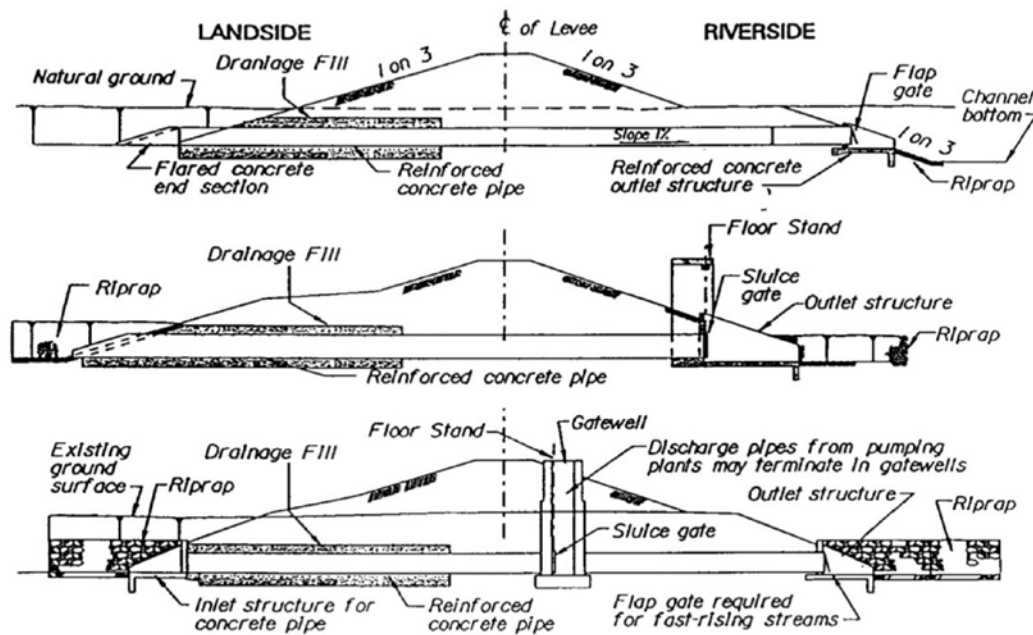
Typical sections, drainage structures through levees (from USACE, 2000)
